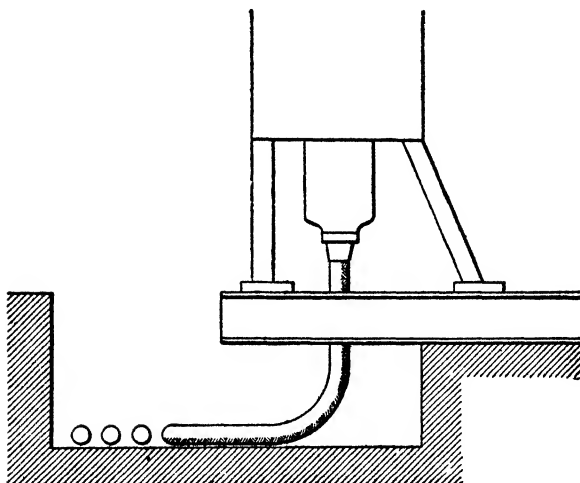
CABLE TRENCH ARRANGED BEHIND THE SWITCHBOARD.
